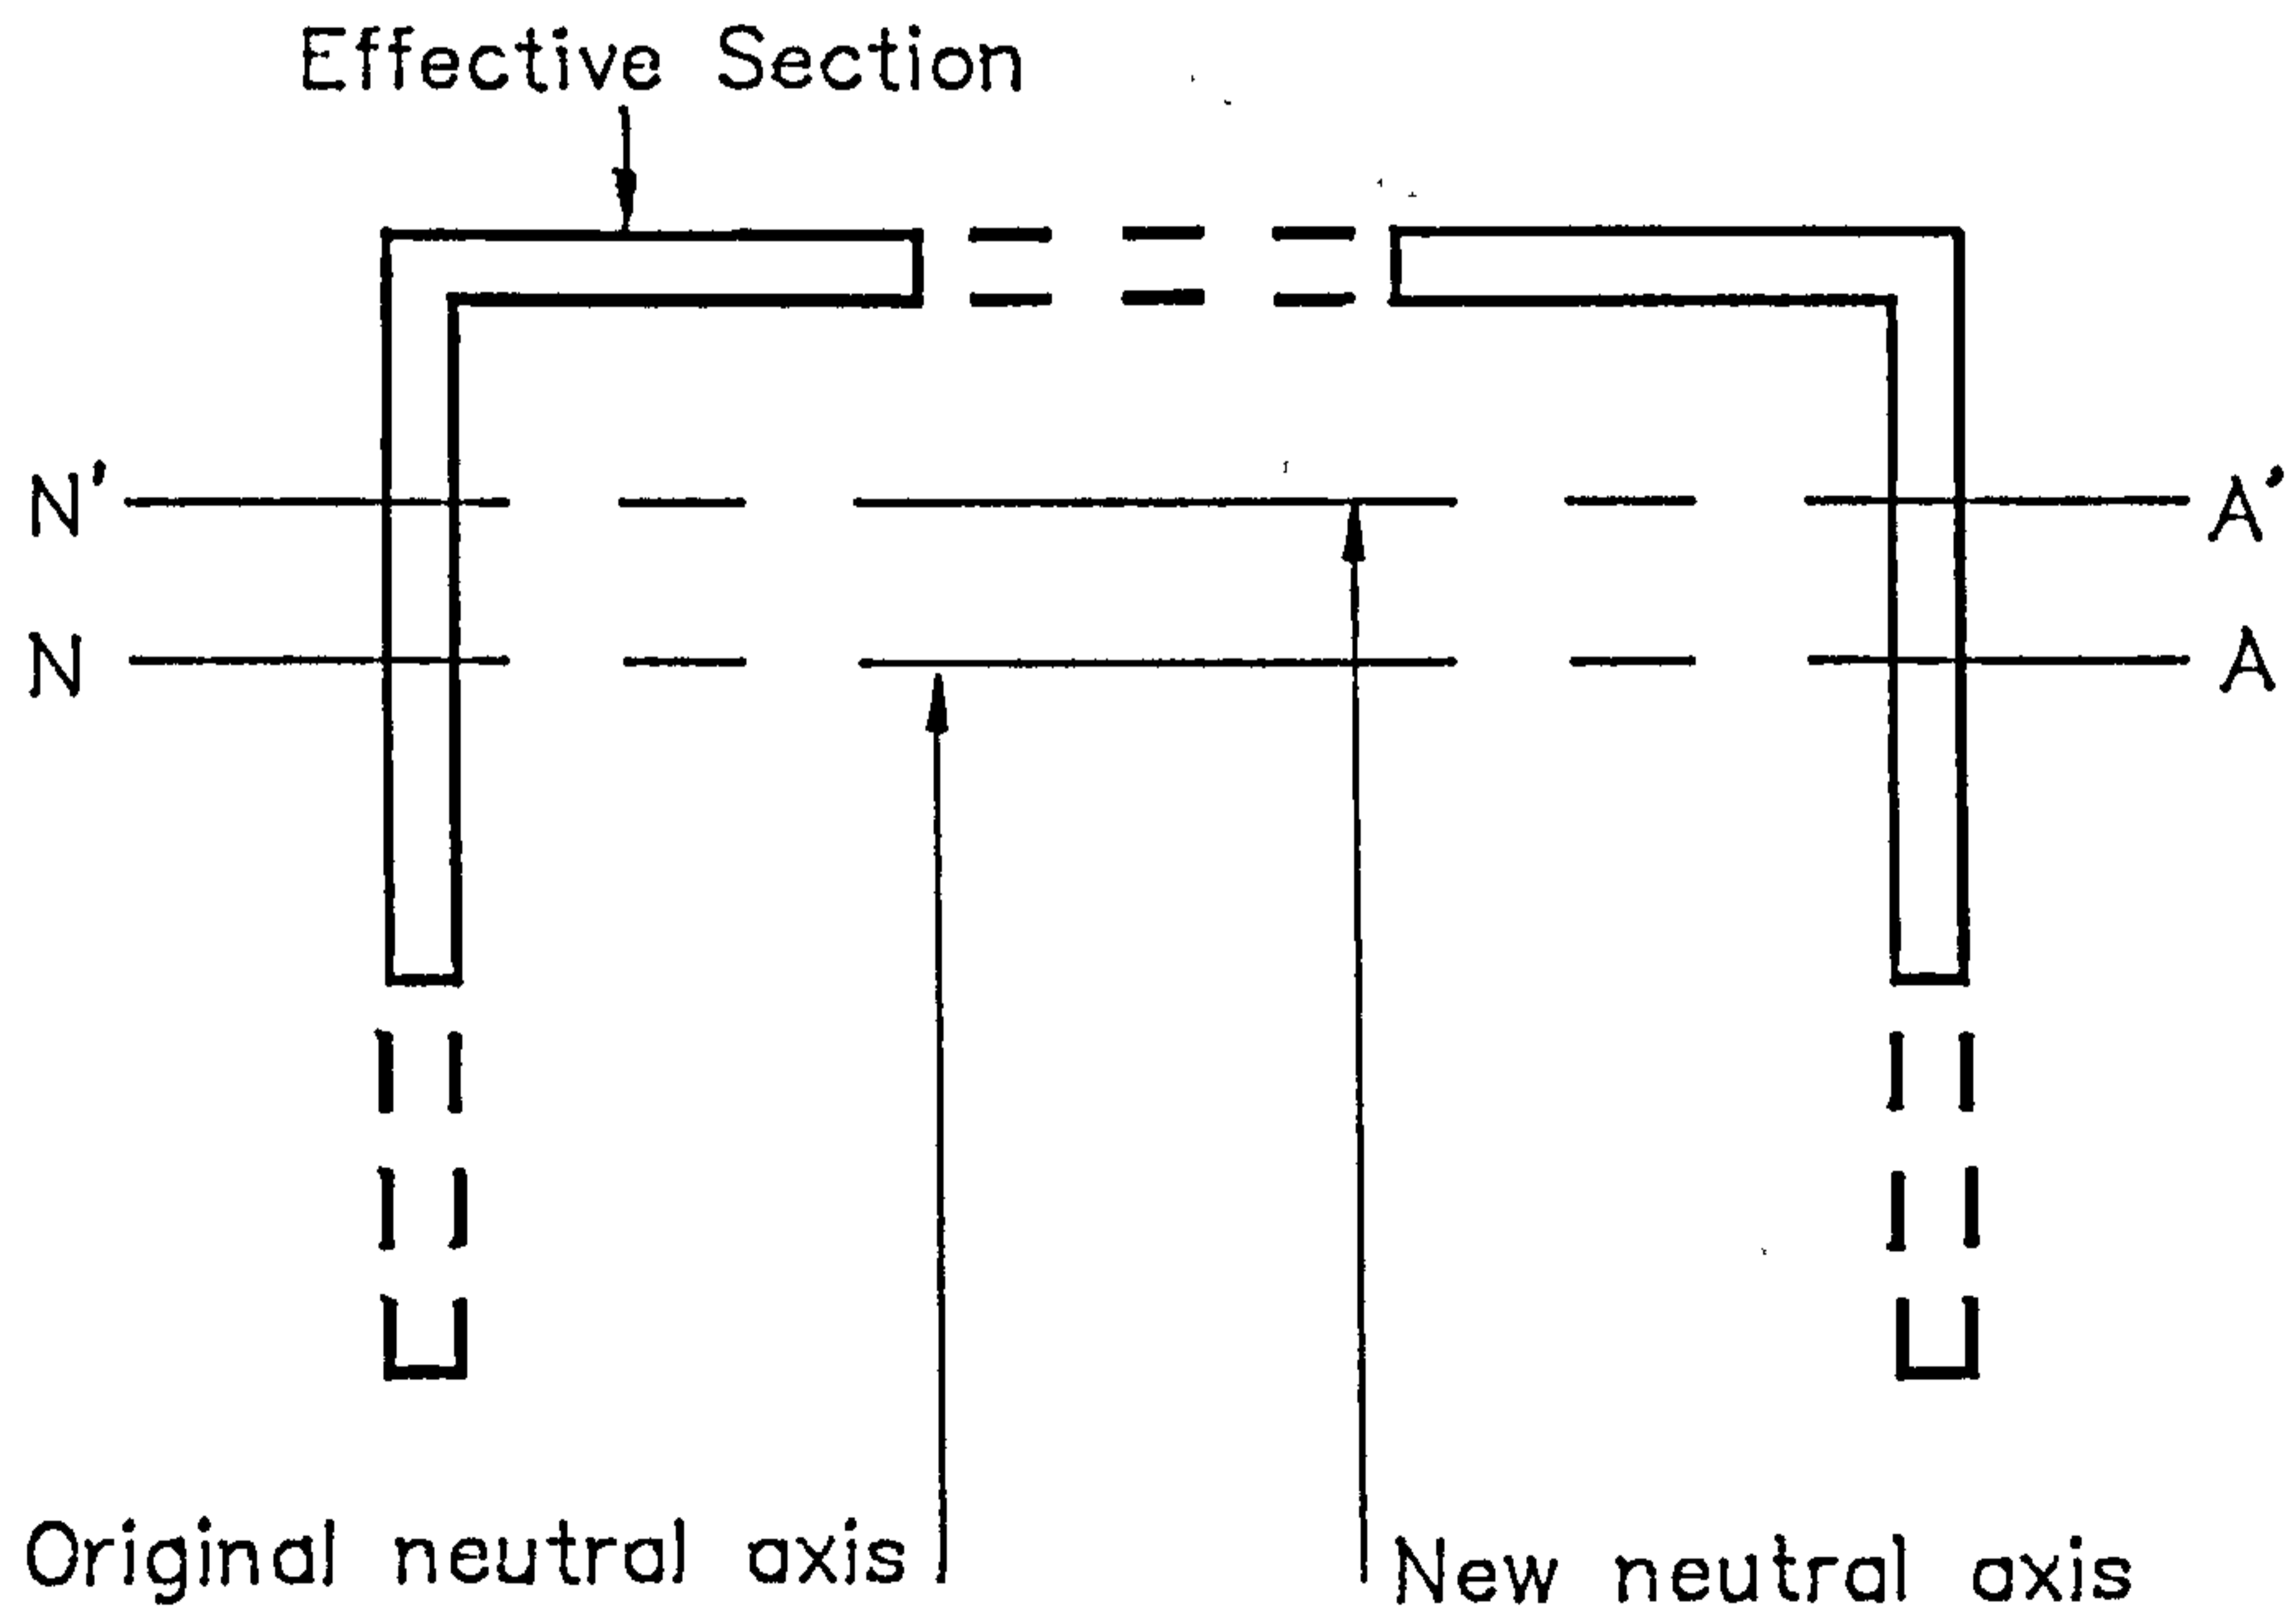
Effective Section With New Neutral Axis Position.
